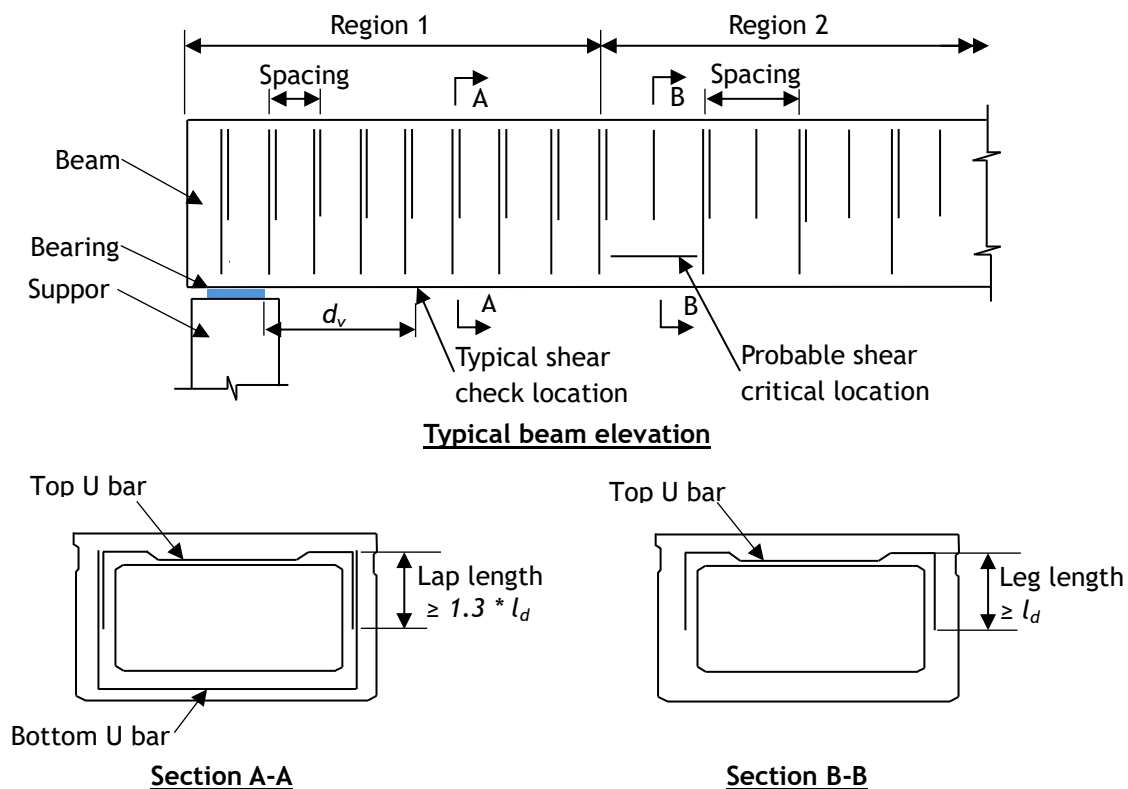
Typical beam elevation and section showing typical shear check location and probable shear critical location.
